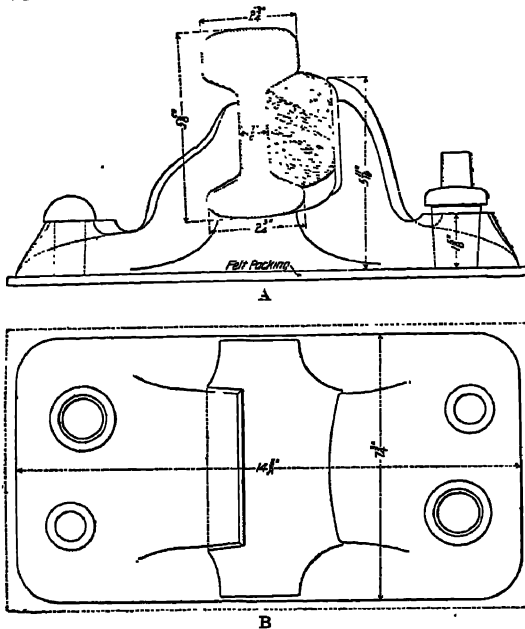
A, section of English bull-head rail, 90 lb to the yard, showing also chair and fastenings; B, plan of chair.
